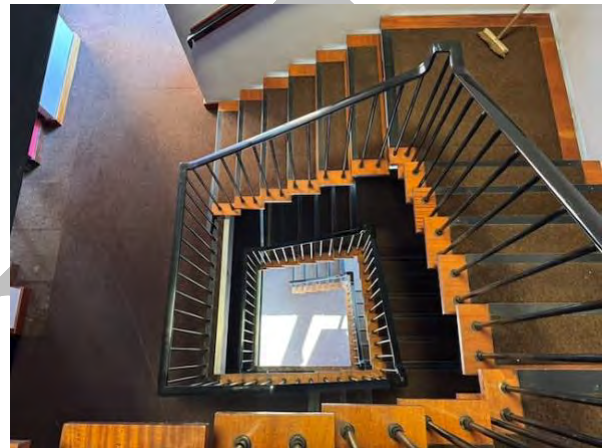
View of the steel framed and timber stairs within the main entrance tower.
